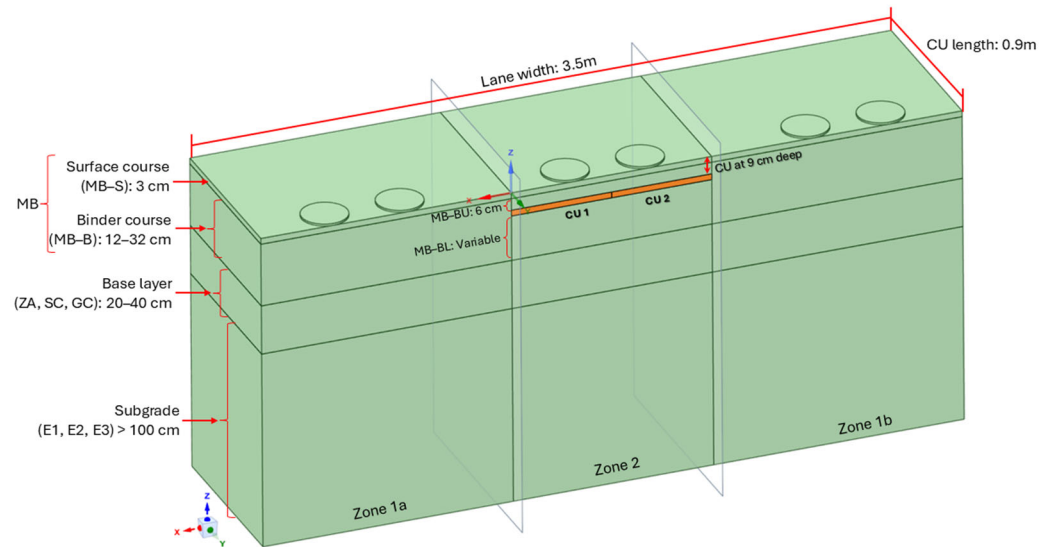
Finite element model geometry of a typical electrified road cross-section.
